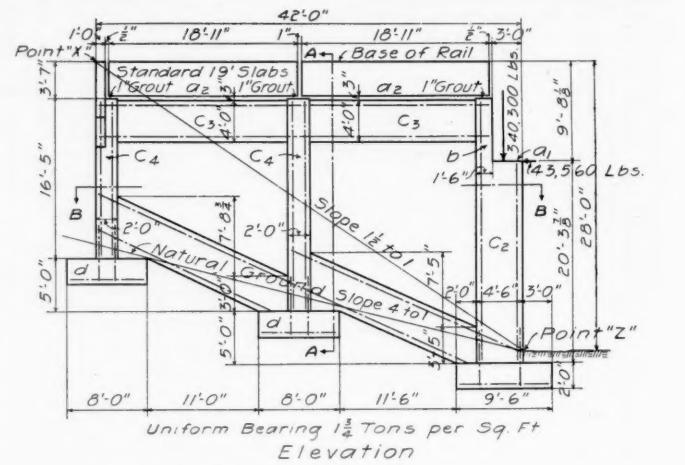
Type C₅; Reinforced Concrete Trestle Abutment.
